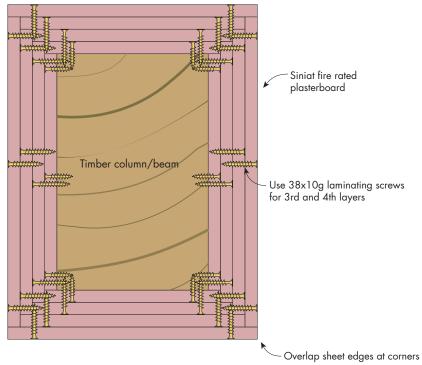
4 Sided Protection Timber Column/Beam Plan or Section
